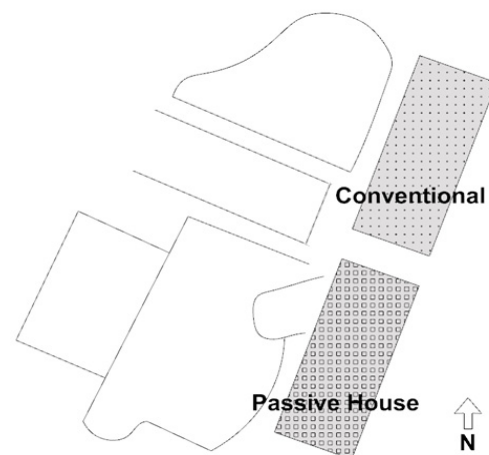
Diagrammatic site plan of conventional and Passive House buildings used in the case study.
